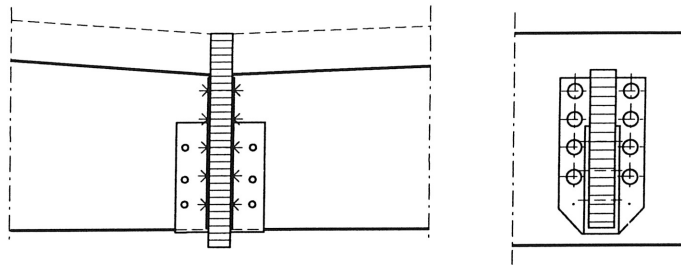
Connection of secondary beams to a main beam by mechanically connected hangers.
